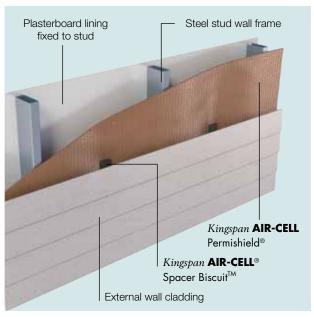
Kingspan AIR-CELL Permishield® on steel-framed wall
